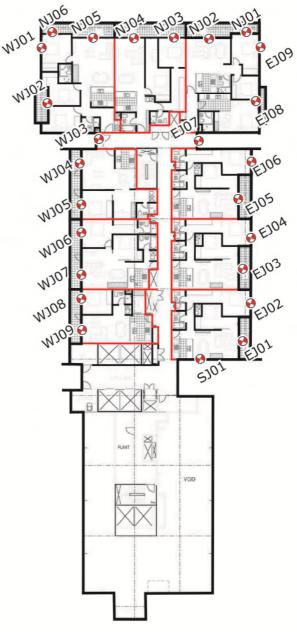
Opening Locations and Internal Apartment Layout - Level 27
